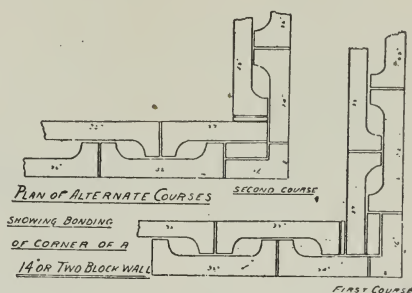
Angular Concrete Blocks. Fourteen-inch Wall.
